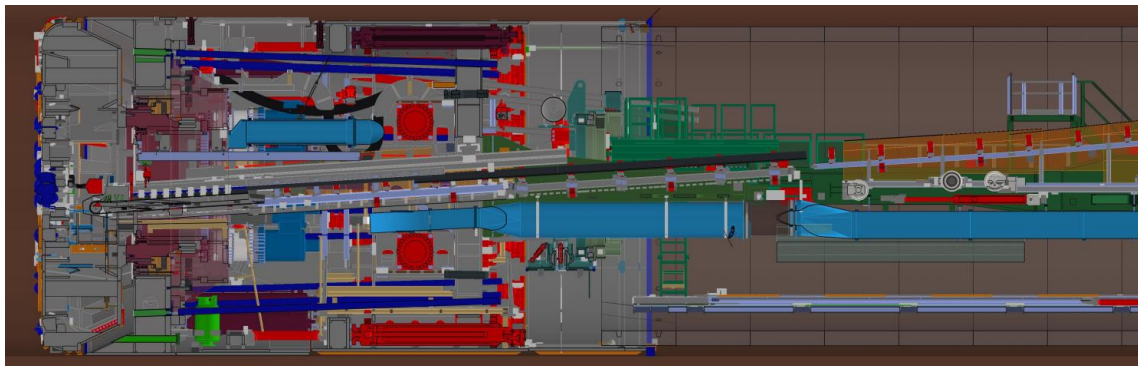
Starting conditions for the shield disassembly (Herrenknecht, 2022)
